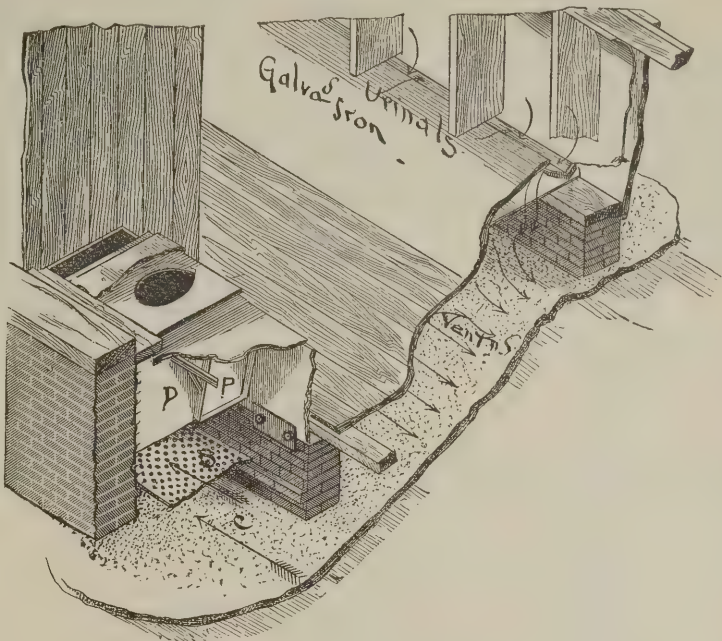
Sectional View of Parts Shown in Fig. 1.
